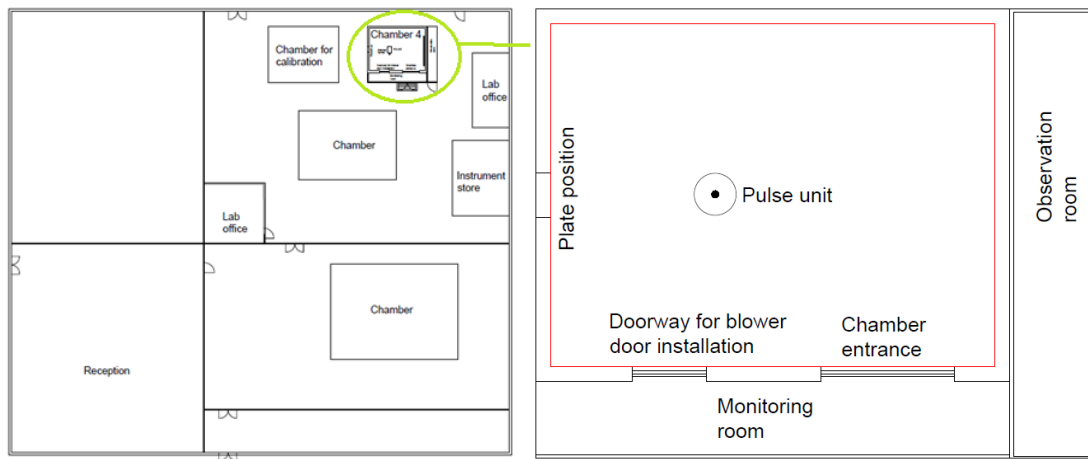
Environmental chamber for testing inside outer building (left) and test enclosure inside the chamber (right)
